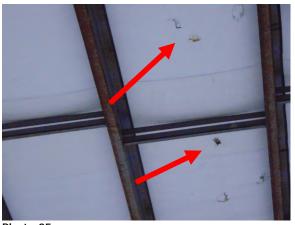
Impact damages at the Joe Phillips Arena's roof insulation
